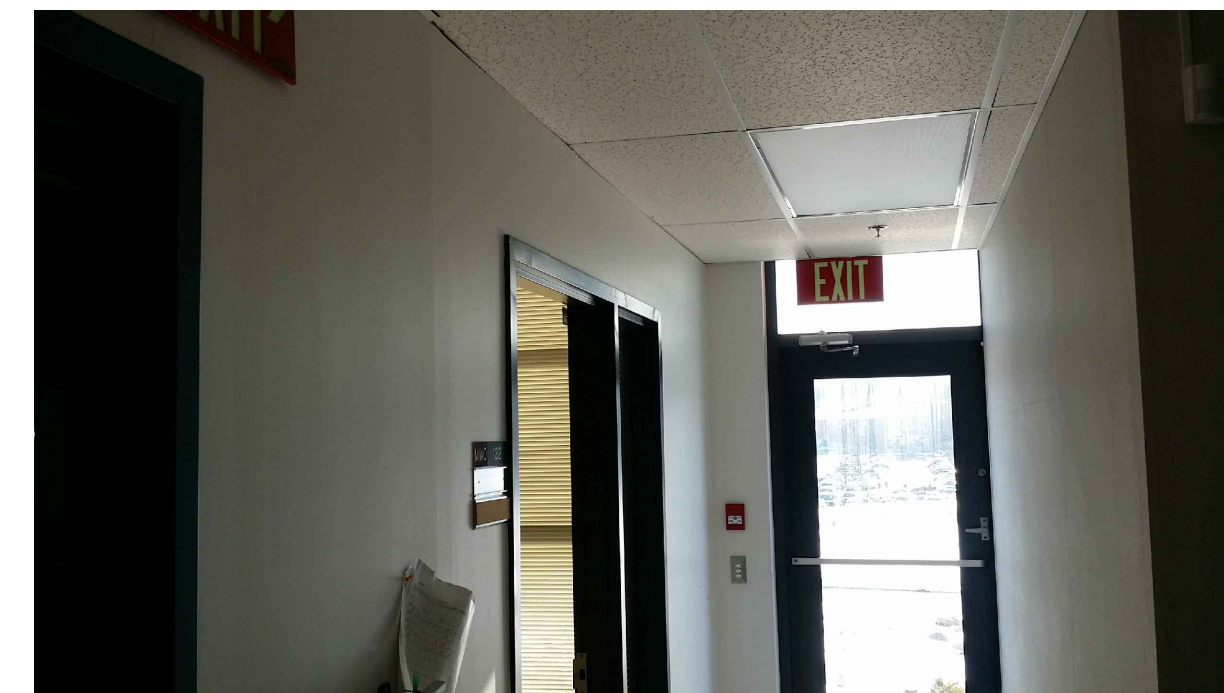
VIEW OF ROOM W119 DOOR AND EXTERIOR DOOR FROM ROOM W118
